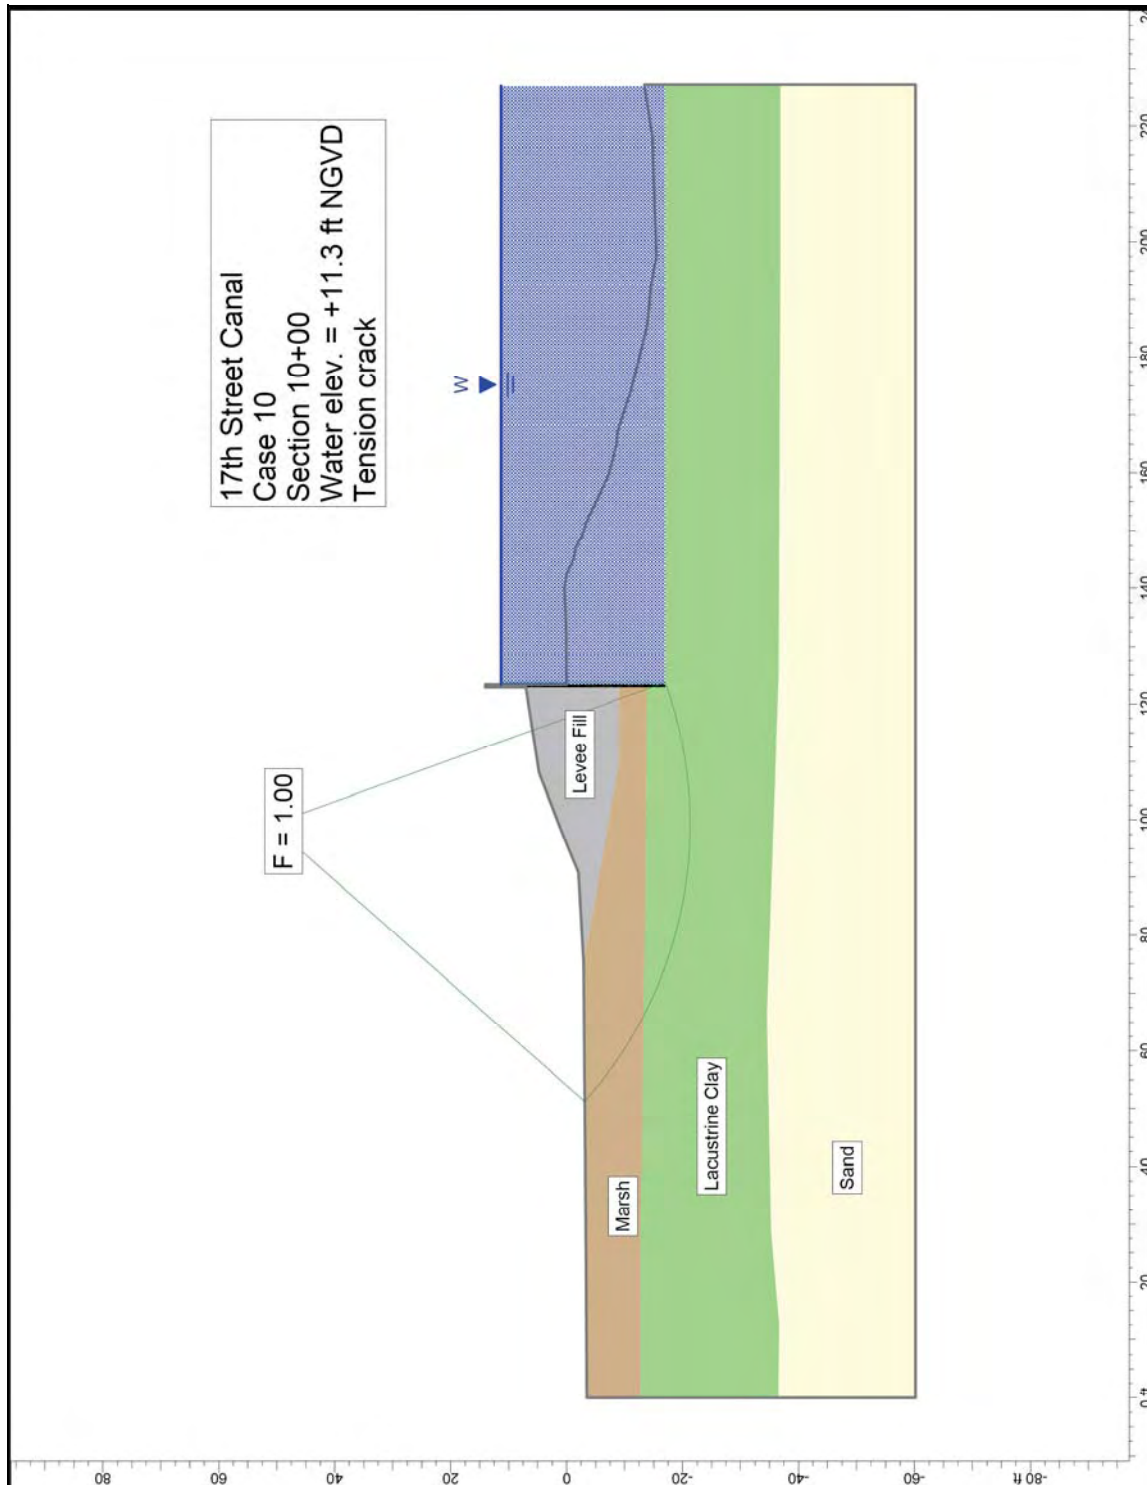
Critical circle for 17th Street Canal Station 10+00 – water elevation 11.3 ft, tension crack.
